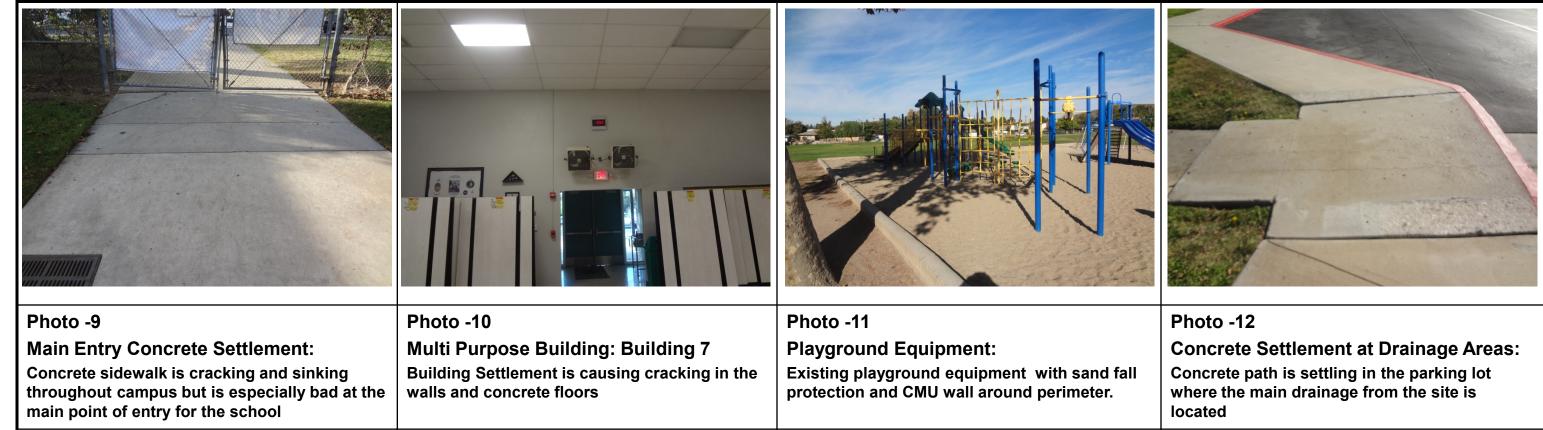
Main Entry Concrete Settlement: Concrete sidewalk is cracking and sinking throughout campus but is especially bad at the main point of entry for the school	Photo -14 Multi Purpose Building: Building 7 Building Settlement is causing cracking in the walls and concrete floors	Photo -15 Playground Equipment Existing playground equipment with sand fall protection and CMU wall around perimeter.
